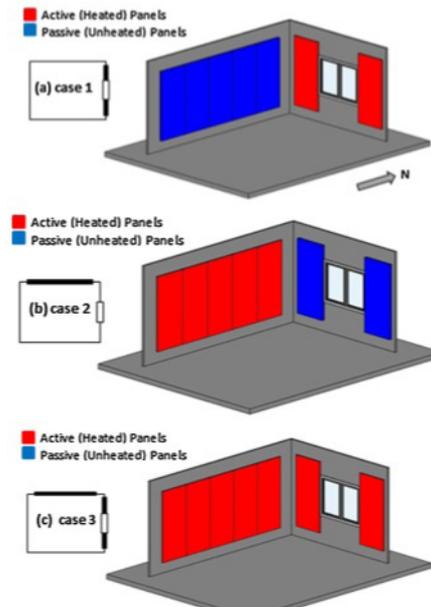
Radiant heating wall panel arrangement (TSE 825, 2008).
